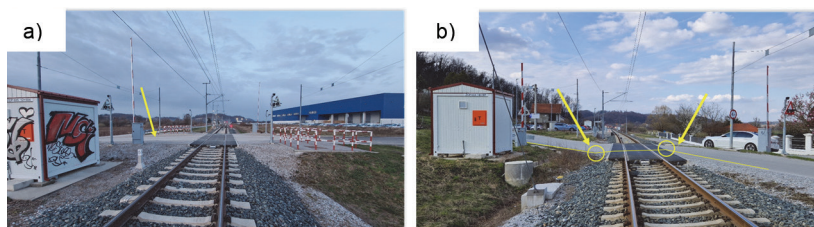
a) Crossing on the railway line R201, secured by half-bumpers, with light-sound measurement and camera, has pedestrian crossing fences. The levelling elements of the new road are well integrated, b) Crossing on railway line R201, secured by half-bumpers, with light-sound measurement and camera, does not have a pedestrian crossing fence even though it is located next to the stop. The elements of the road level are poorly integrated into the transition itself and the existing condition (big “jumps” when crossing)
